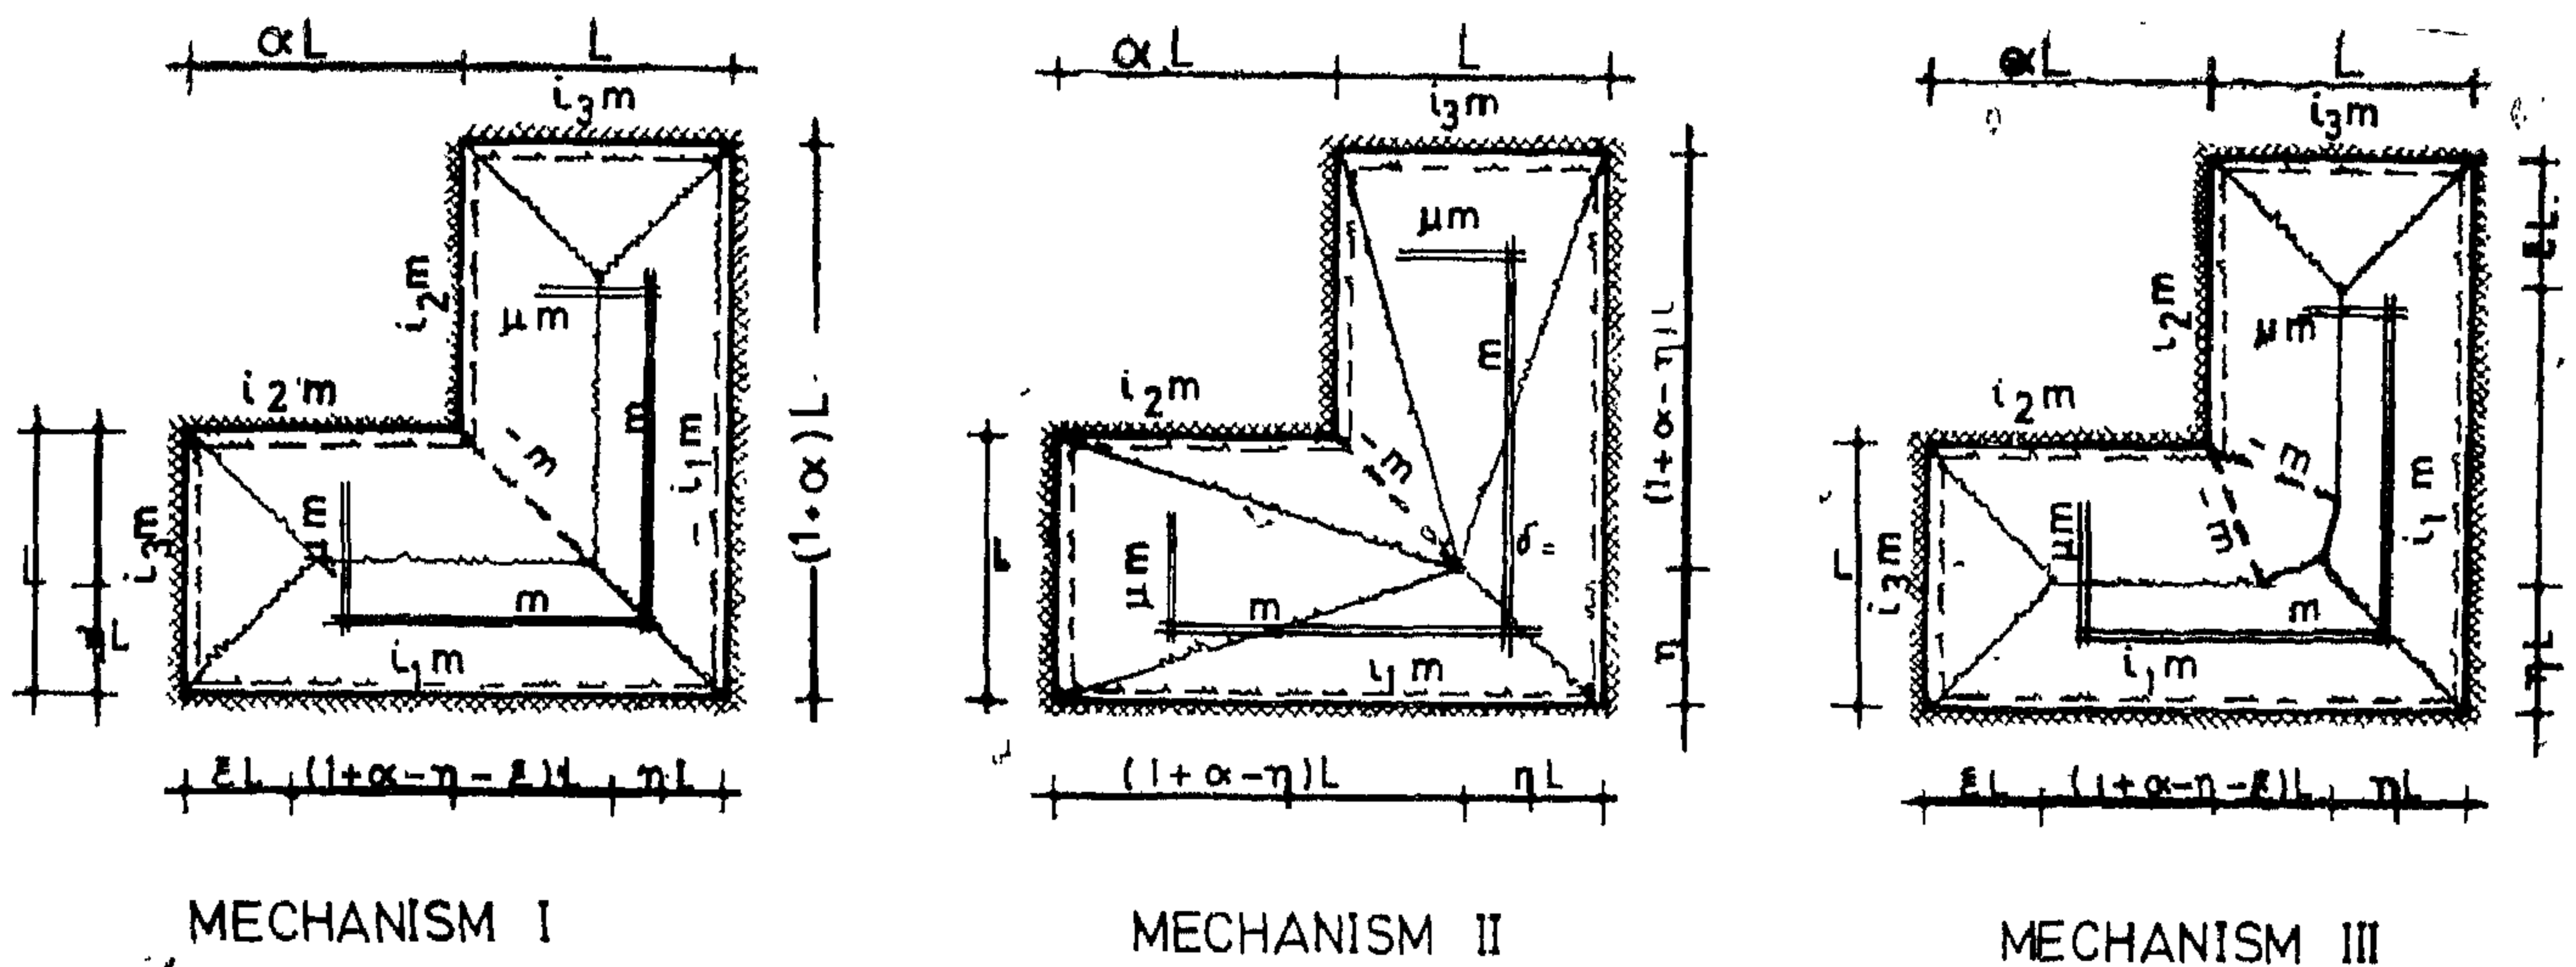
COLLAPSE MECHANISMS OF CORNER SLAB SUBJECTED TO UNIFORM LOAD
